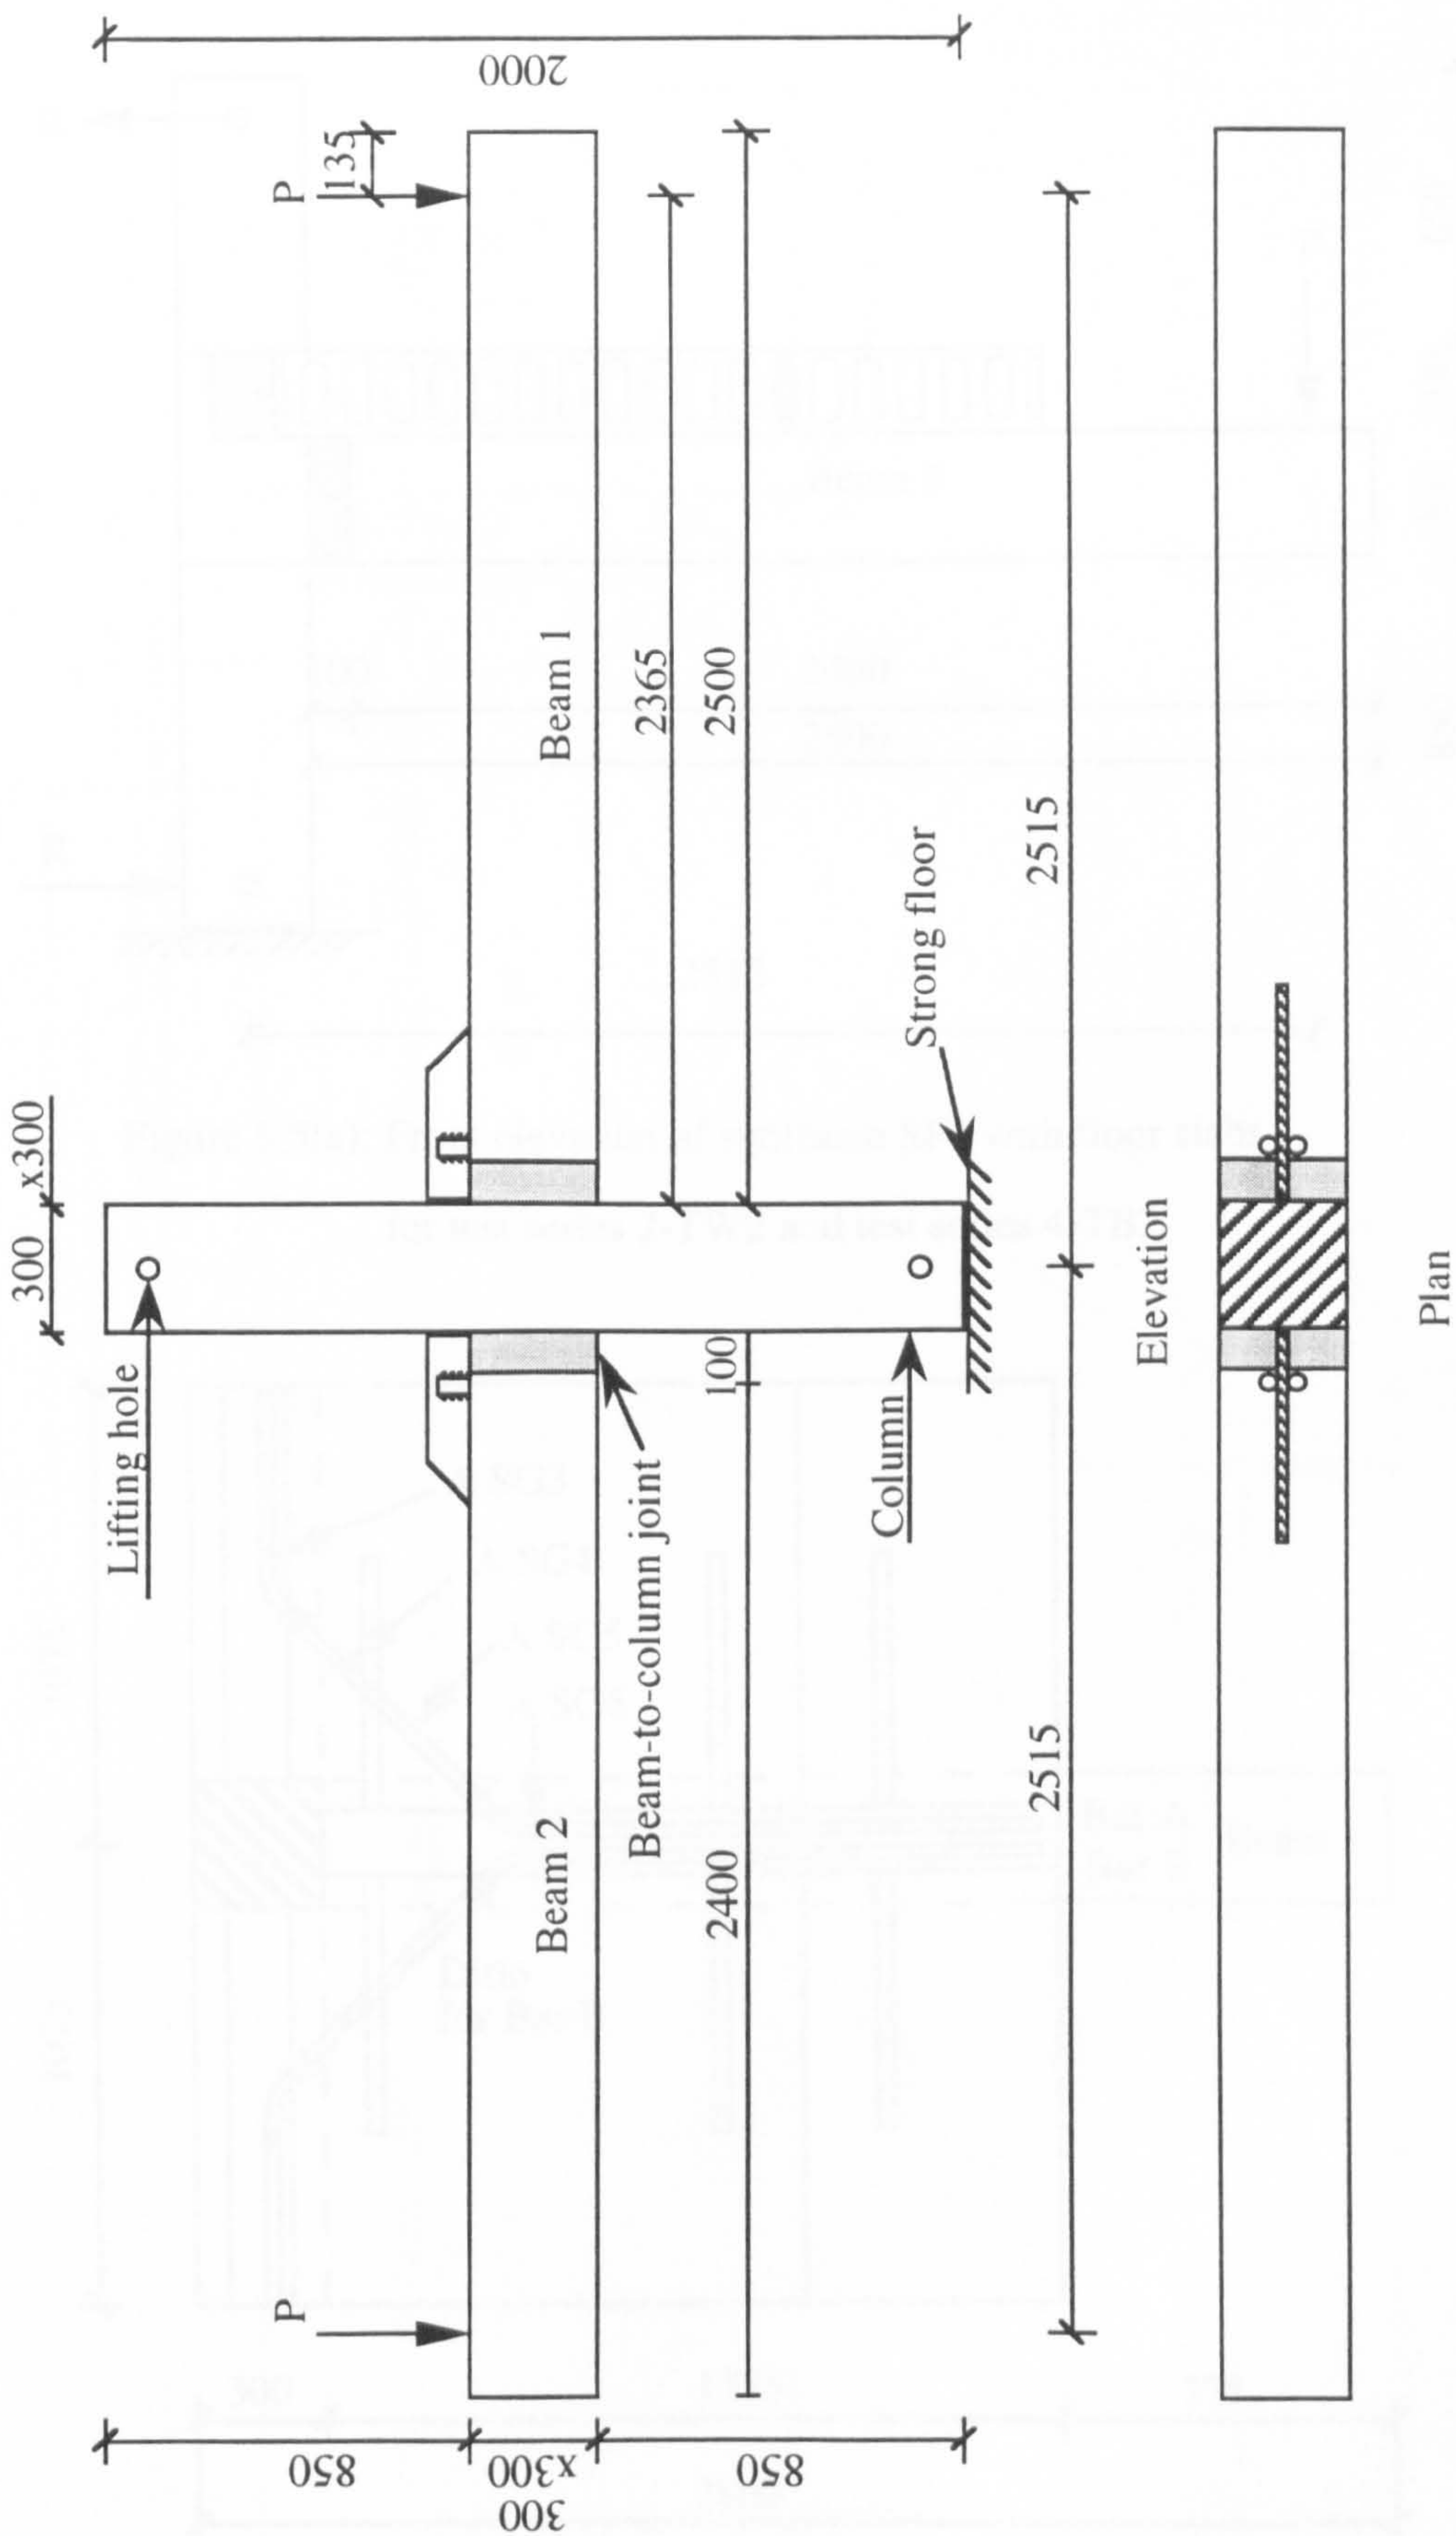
Subframe SF1 without floor slabs for test series 1-TW1(C)
